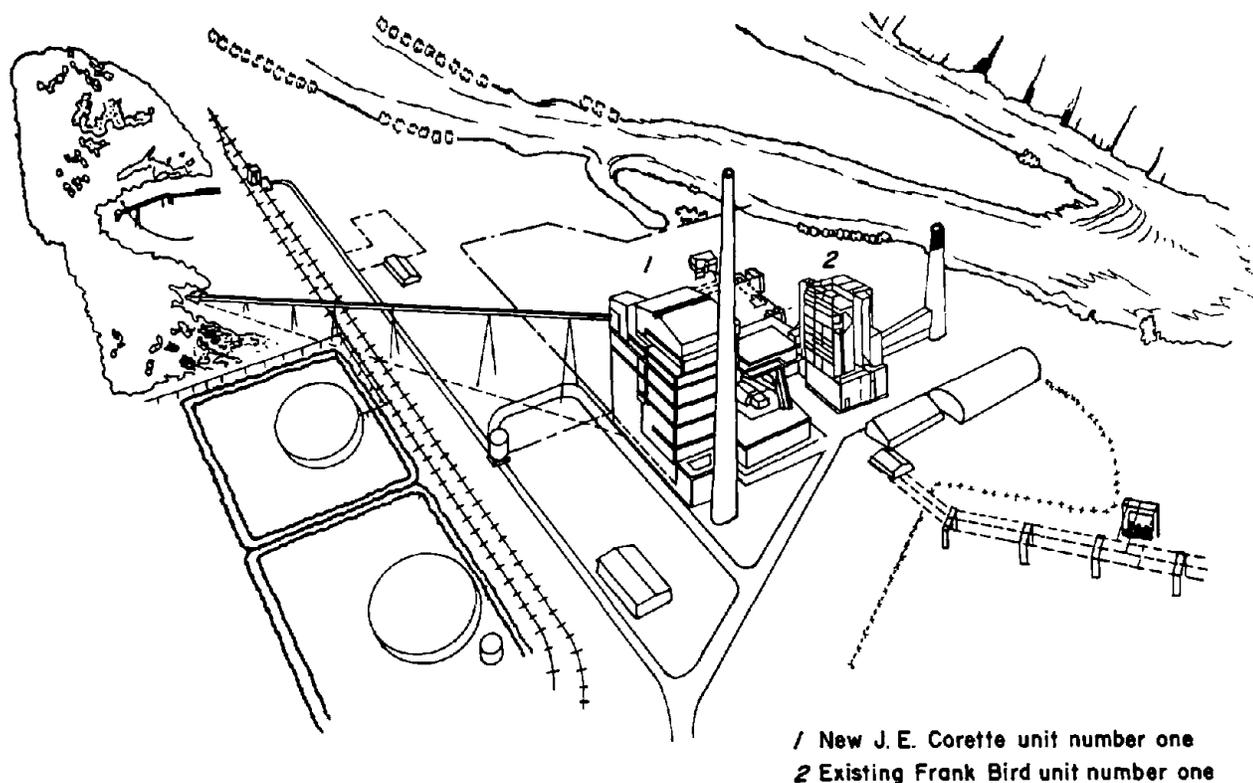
Plant Arrangement Showing Coal-Handling Facilities.
